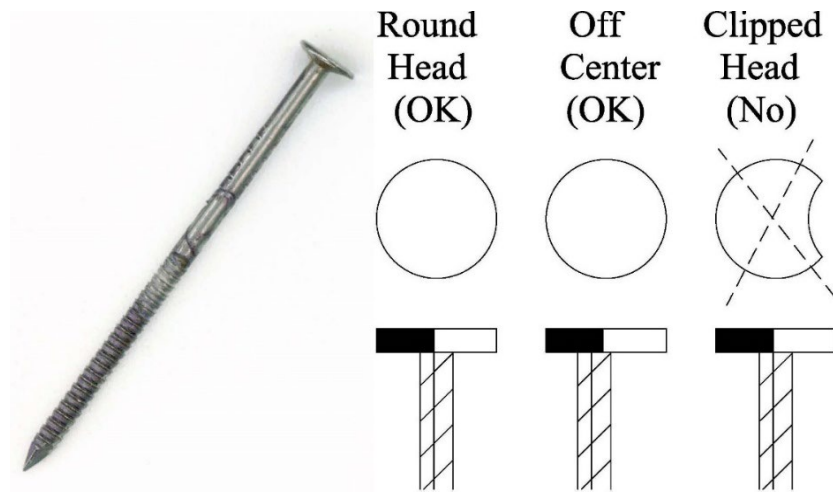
Use 8d ring-shank nails when attaching roof sheathing.
